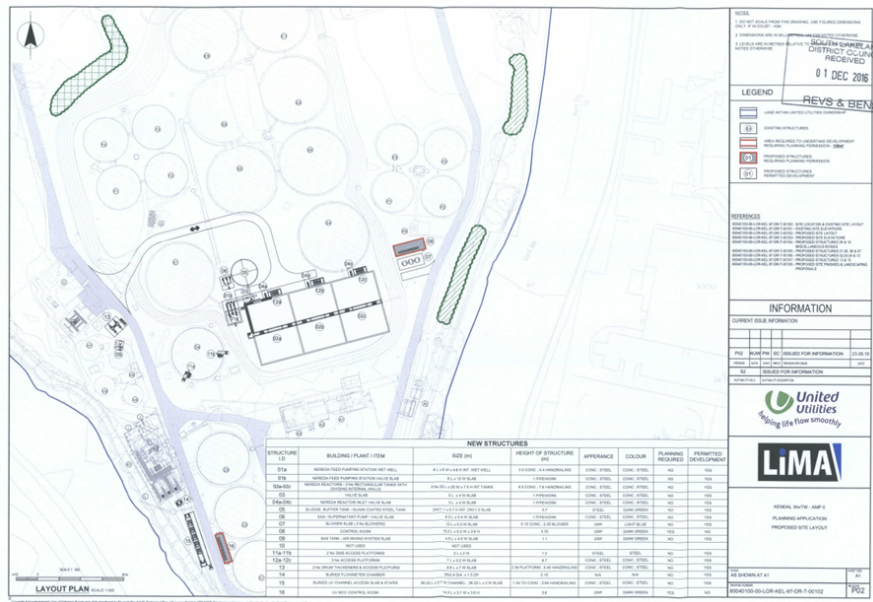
Kendal WRC: Planning Consent 5/16/9012 – Site Location & Existing Site Layout
